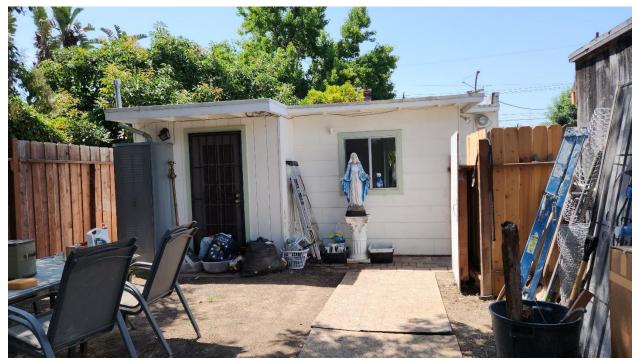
North elevation, view facing south. Source: GPA Consulting, July 2024.
